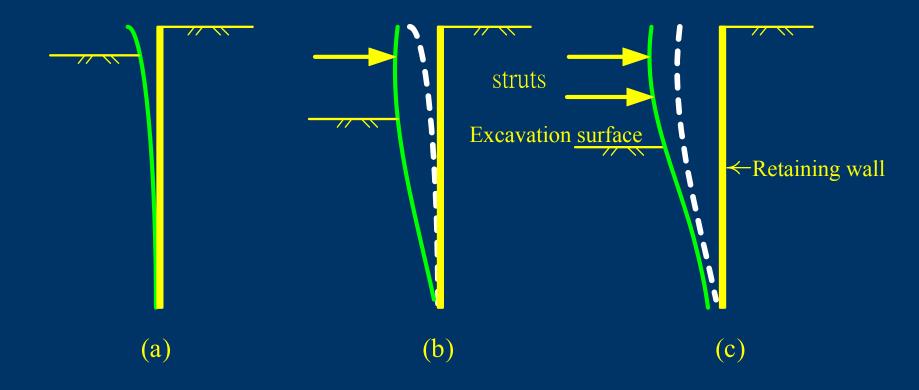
Relation between the shape of wall deformation and low strut stiffness
